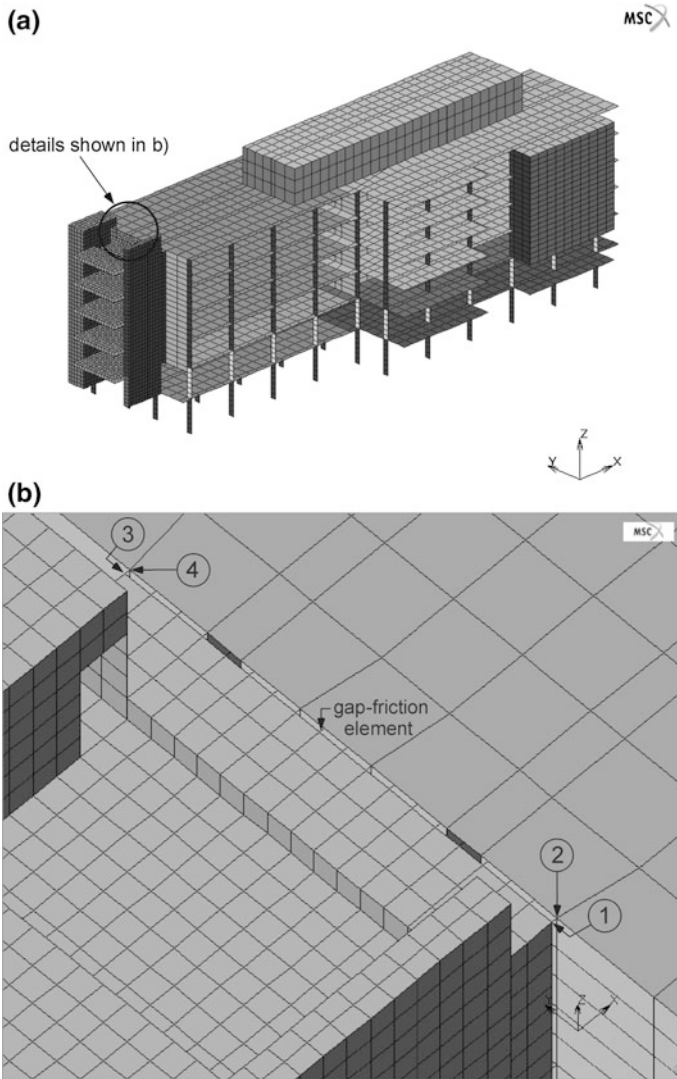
FE model of interacting stairway tower and main building (Jankowski 2009). a General view. b Details of separation gap
